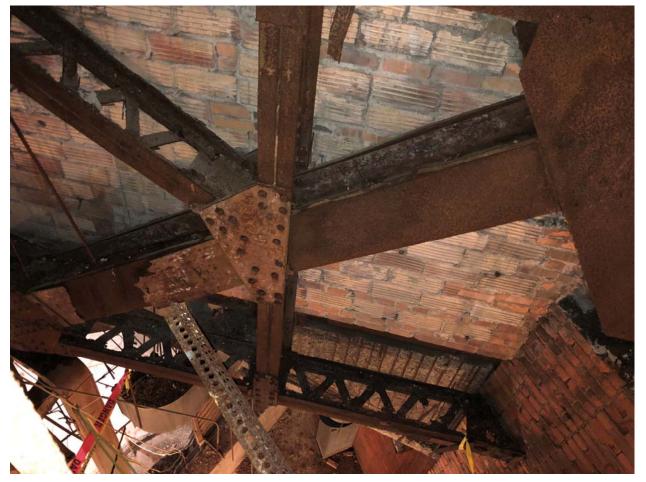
Condition of the larger members of the interior steel framework is fair with mostly surface rust, however the smaller steel members such as the webs of the steel trusses are severely deteriorated. This seems typical throughout the steel structure that was able to be observed.
